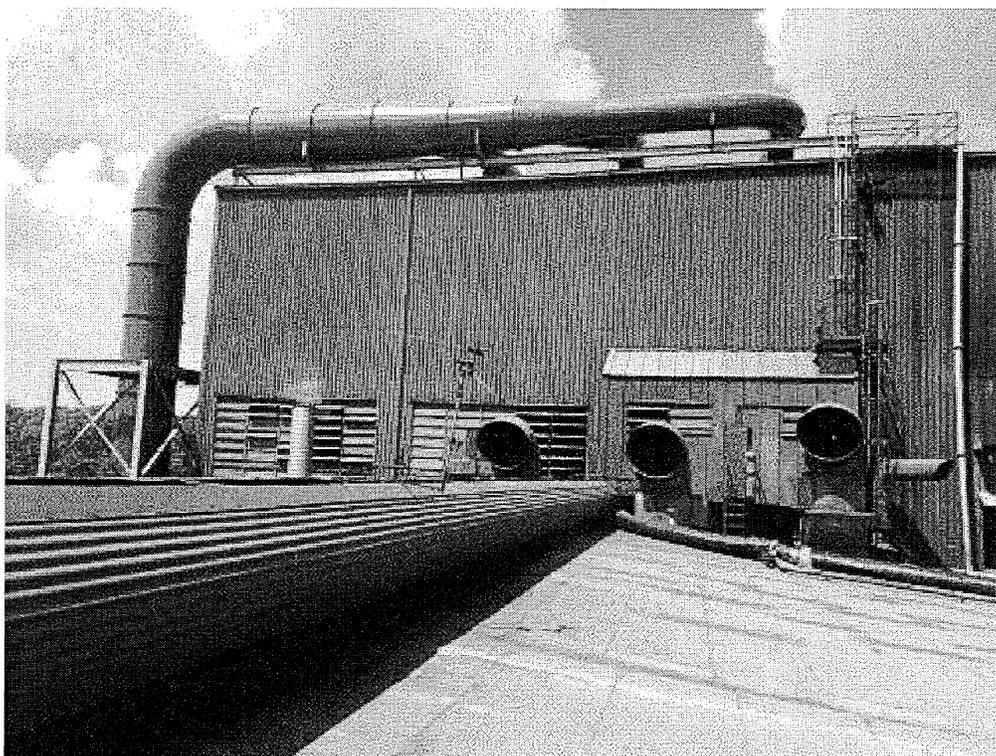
(Melt Shop Roof) : Melt Shop roof with new ventilation ducts for new bag house visible.
